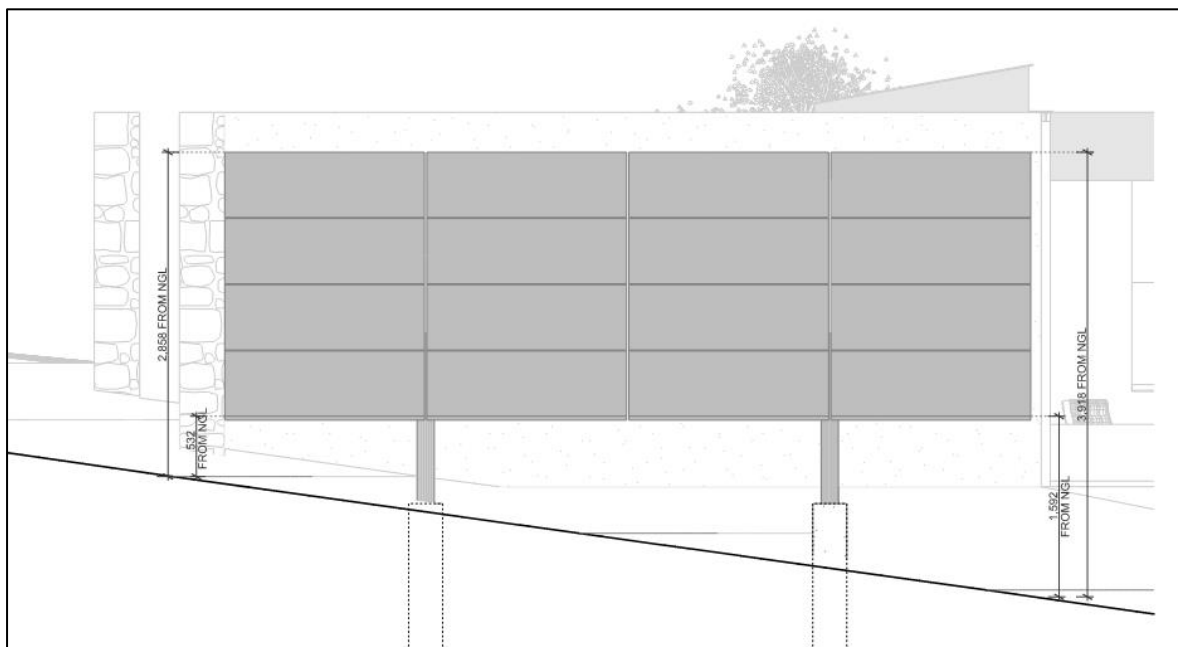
Proposal plans – Northern Elevations – Solar Panel
